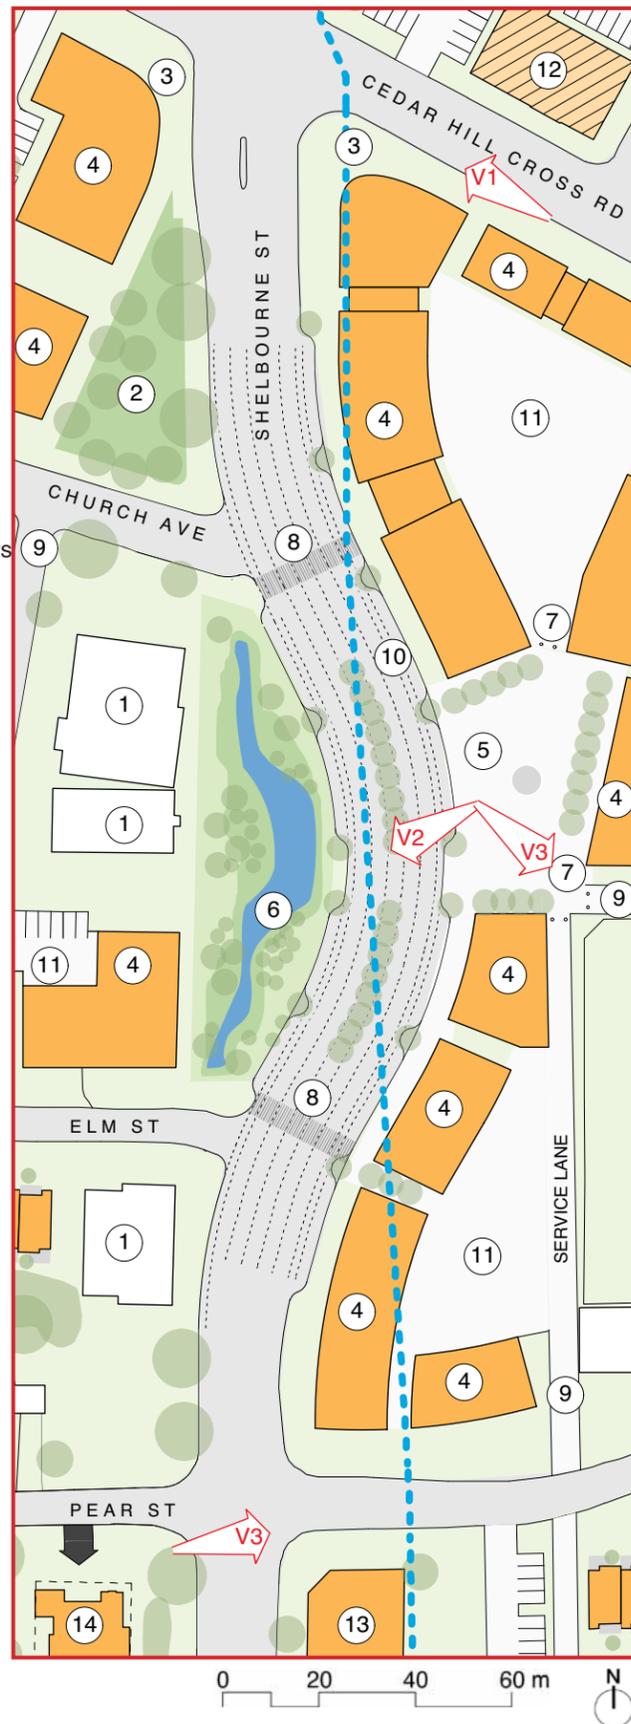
Potential Massing of New Building Developments in Shelbourne Village
